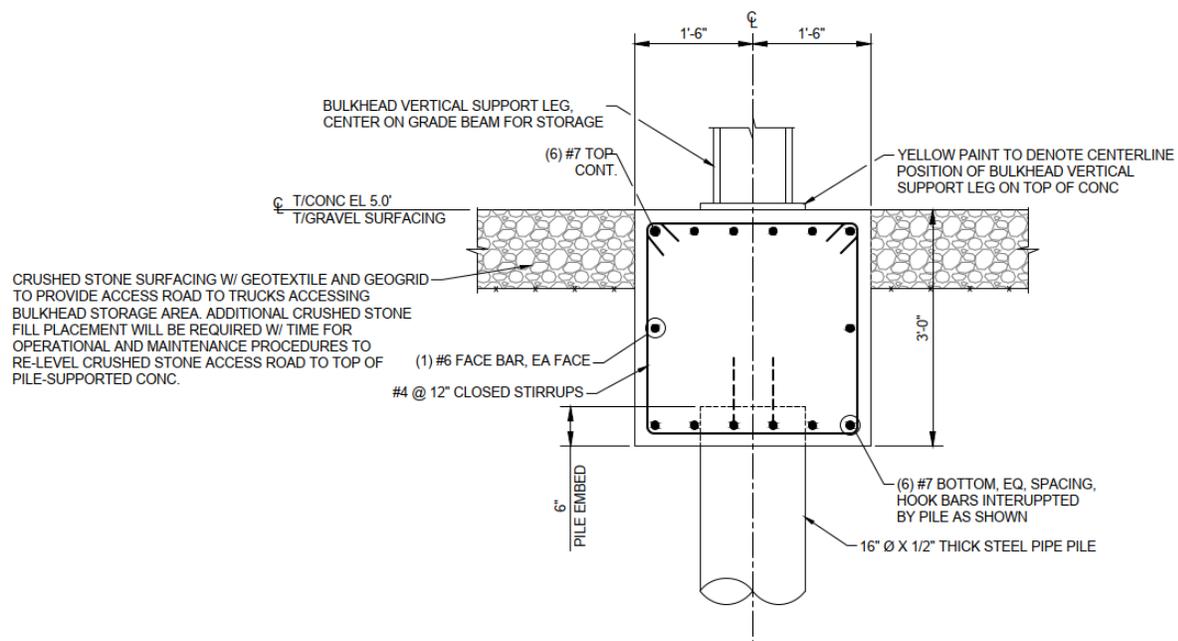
Bulkhead Storage Support Grade Beam Cross-Section
